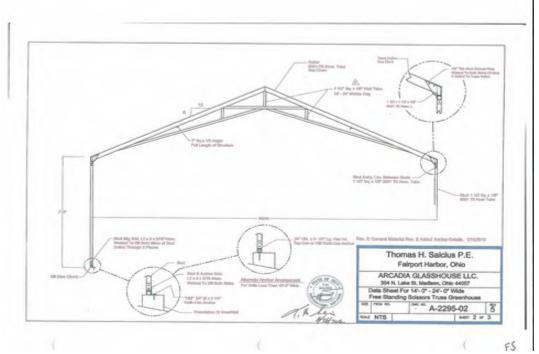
Arcadia Glasshouse Sample Engineering Drawing #1
